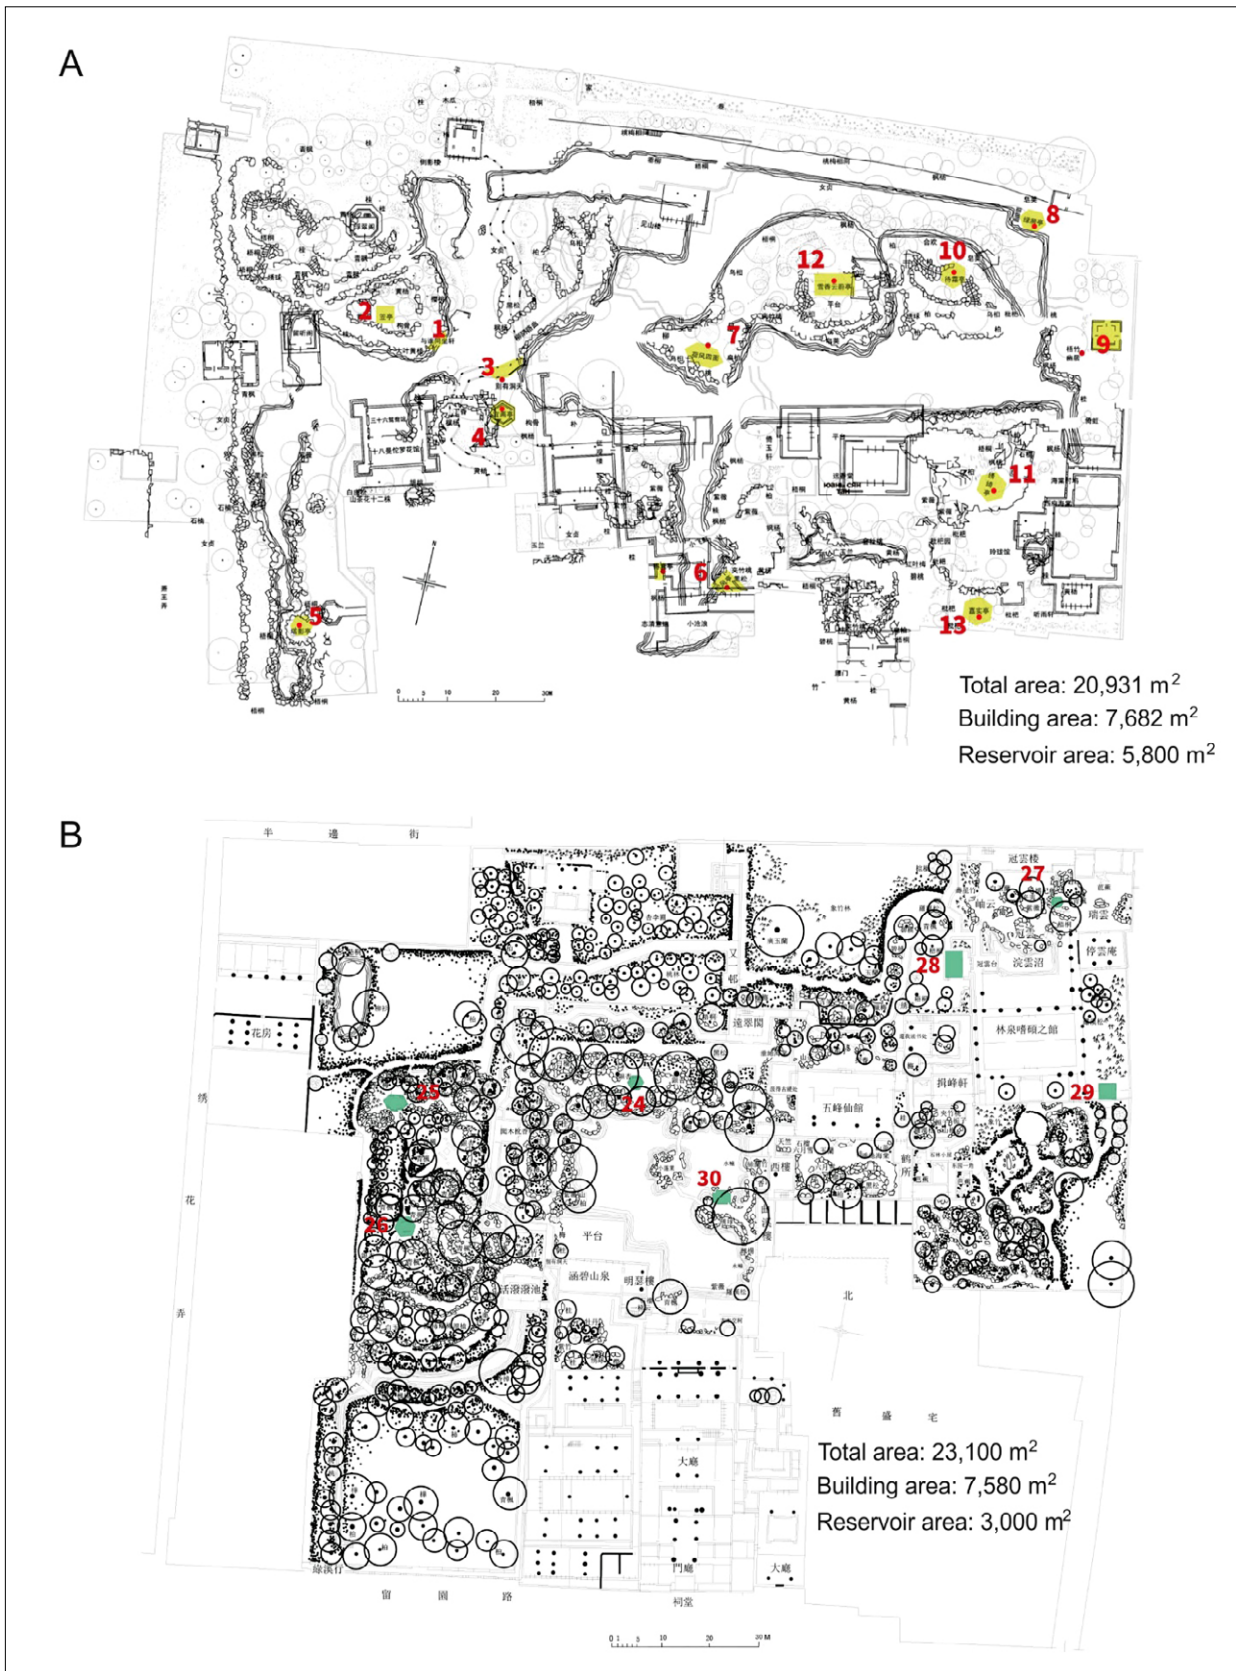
Examples of the most famous Suzhou private gardens: A—plan of the Zhuōzhèng Yuán Garden, B—plan of the Liú Yuán Garden.
